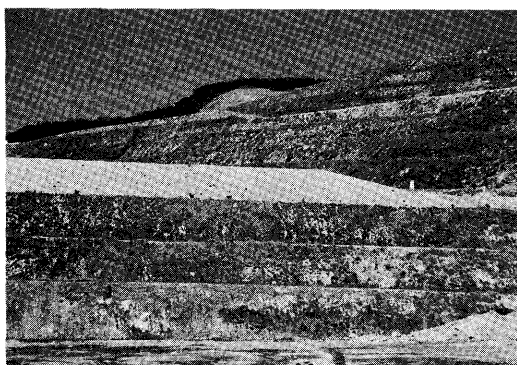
The observation site of after shock at HIRA, Hokudan-Cho.
